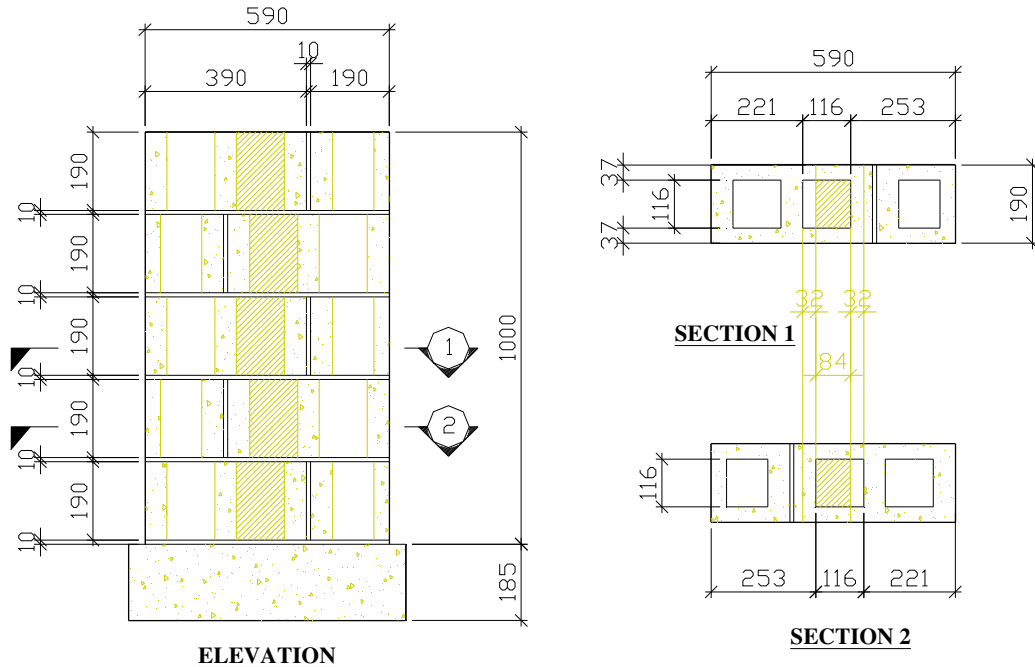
Elevation and cross-sections of a wall specimen, showing the shifted hollow cores (dimensions in mm).
